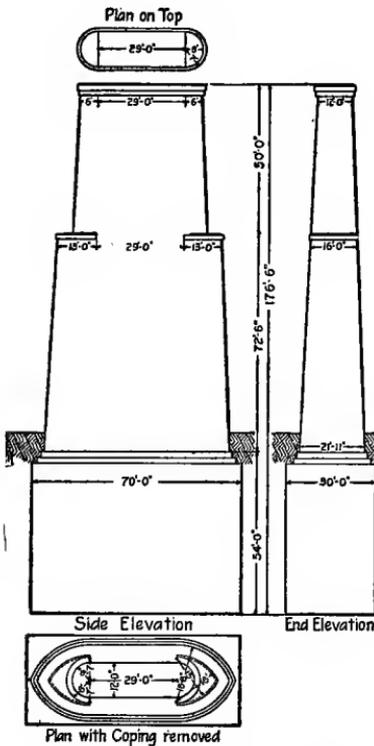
CHANNEL PIER, CAIRO BRIDGE, I. C. R.R.
